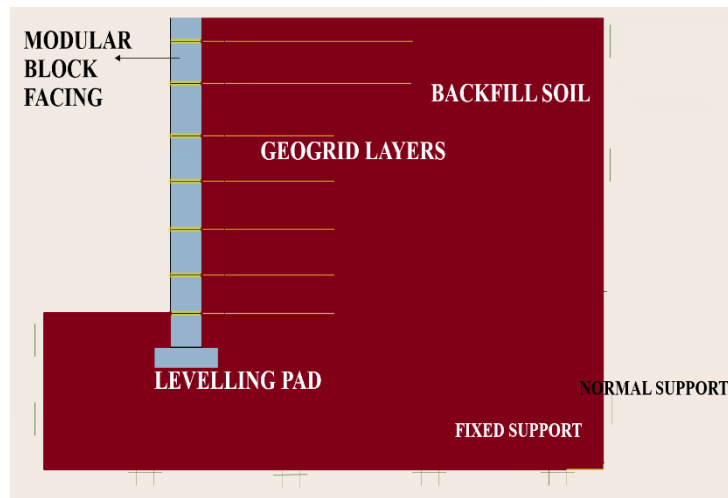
A single-tiered MSE wall model (12m) considered in the present study
